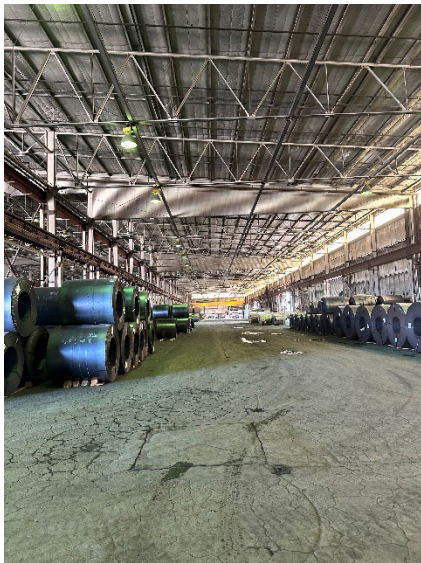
West bay steel truss framing to wide flange steel columns. Minor corrosion at base of exterior columns, remainder in good condition. Clean and paint all exposed steel.
